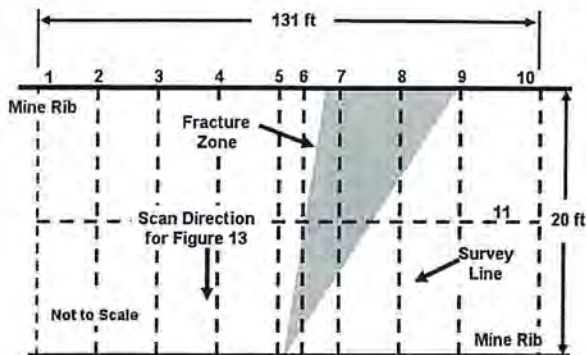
Layout of GPR mine roof survey area in B-Drift (Site 3).
